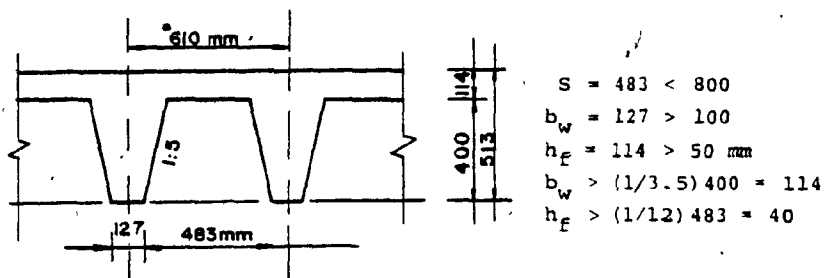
TYPICAL SECTION OF ACTUAL FLOORS
